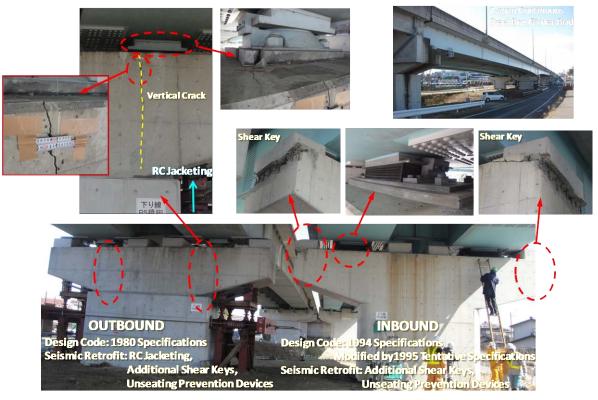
Comparison of Damage Mode between Adjacent Two Bridge Columns
